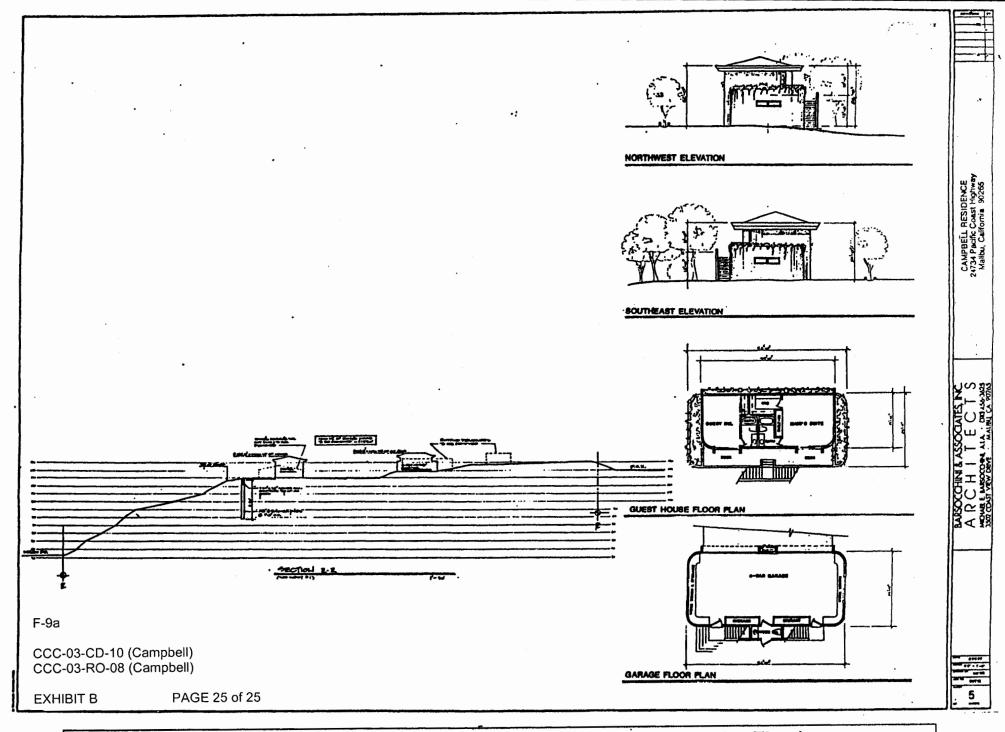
(4-97-102) Cross Section of Project Site and Guest Unit Floor Plans/Elevations
